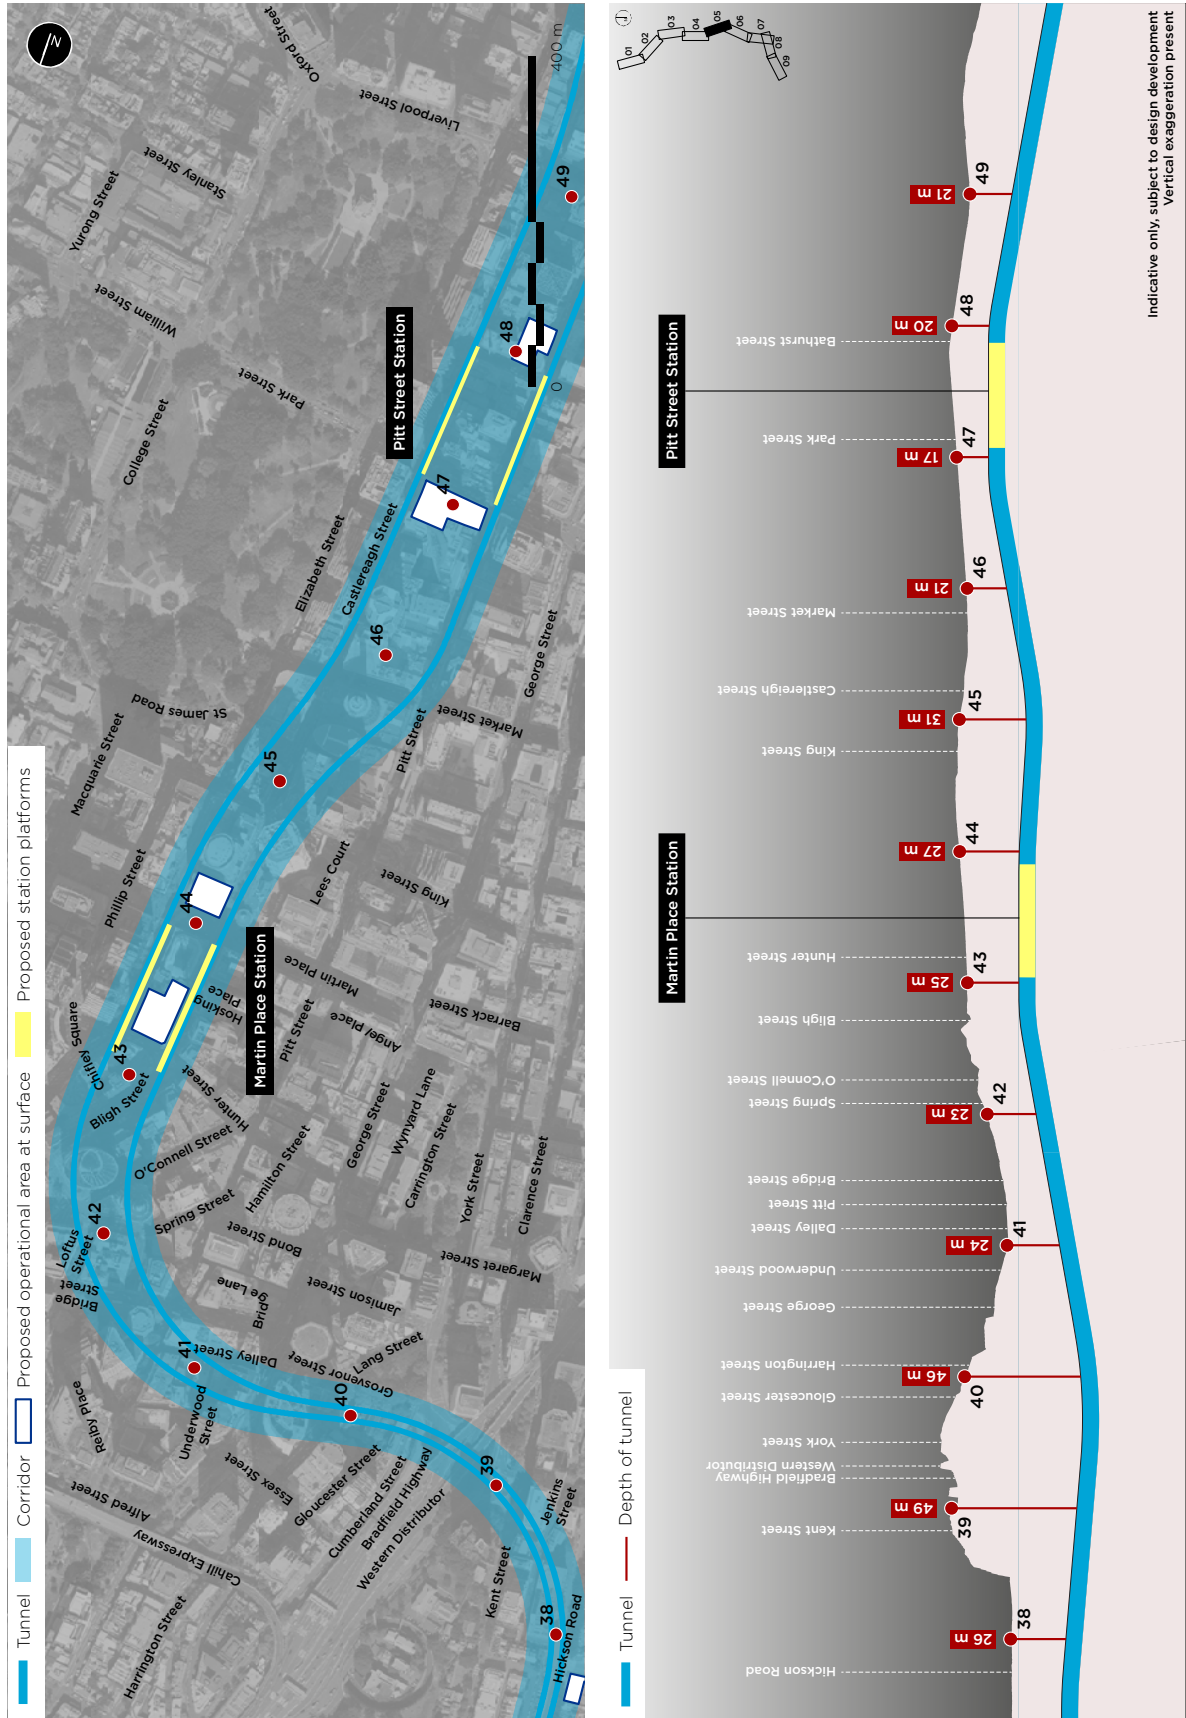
Indicative Chatswood to Sydenham alignment plan and long section
